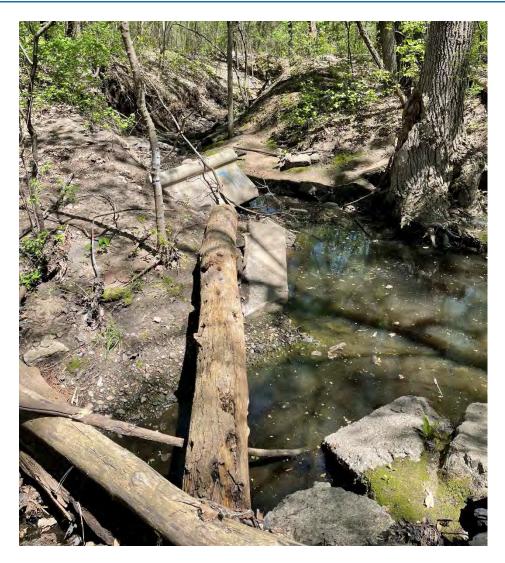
Pond SR-4 Downstream Outlet Channel Erosion and Construction Debris
